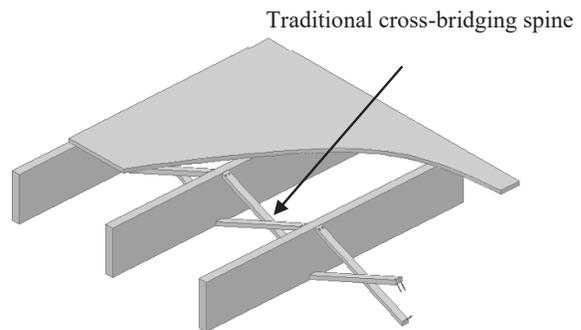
A wood floor with a row of traditional cross-bridging elements, connected by two nails with wood joists.
